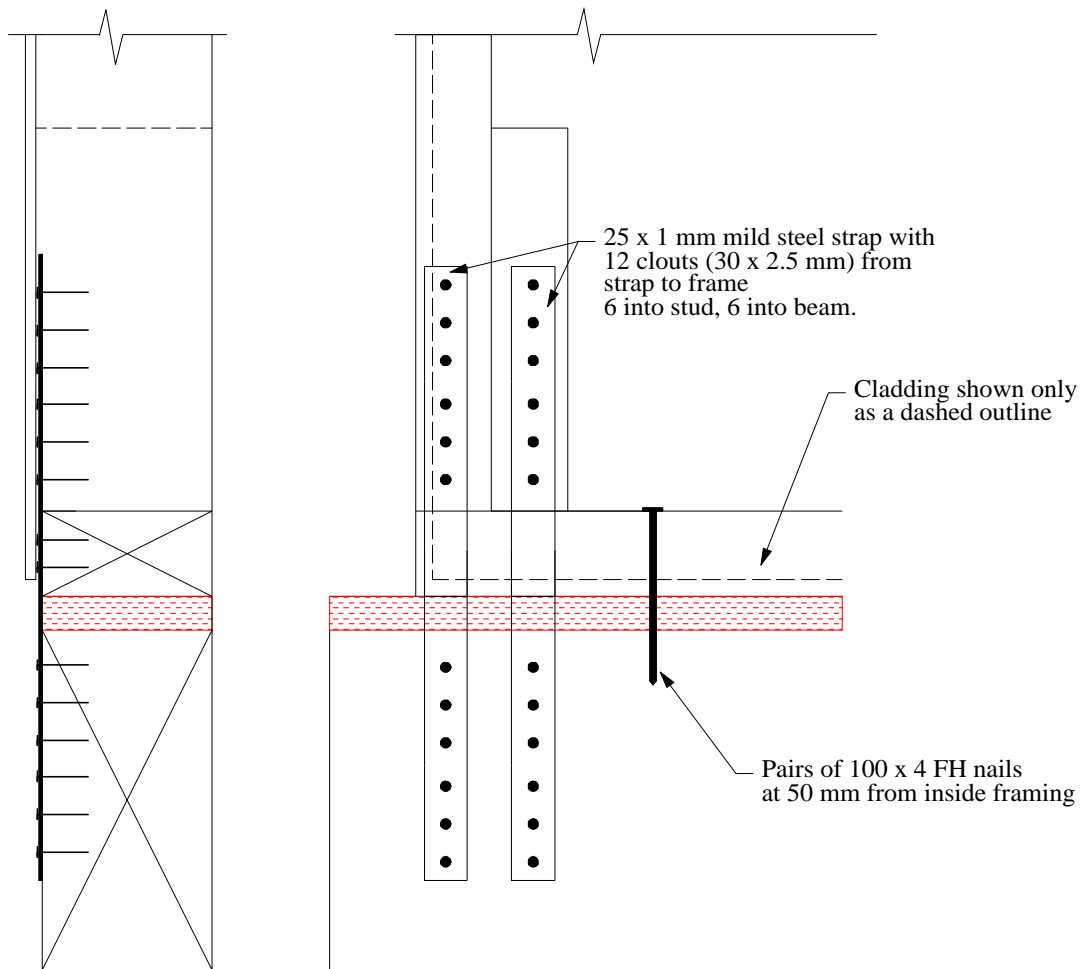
Connection of 0.6 m Long Wall to Timber Foundation
